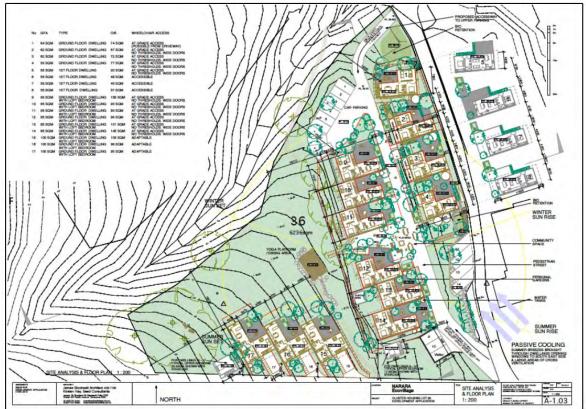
Site Plan showing number of Units - note that Units 1-8 are 2 storey building (Source: McGregor Coxall)
